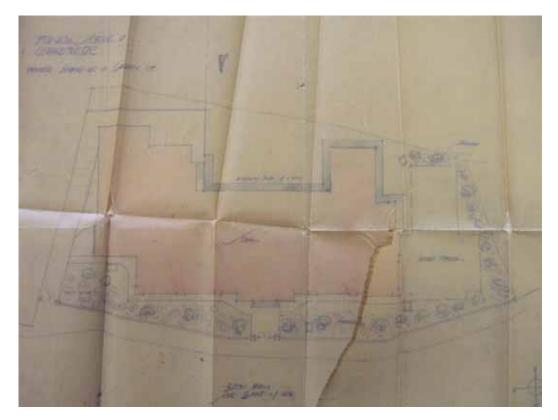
Plan of Technical School, Oswaldtwistle, 1911 (UDOS Acc 8099/5/Plan No 853)
